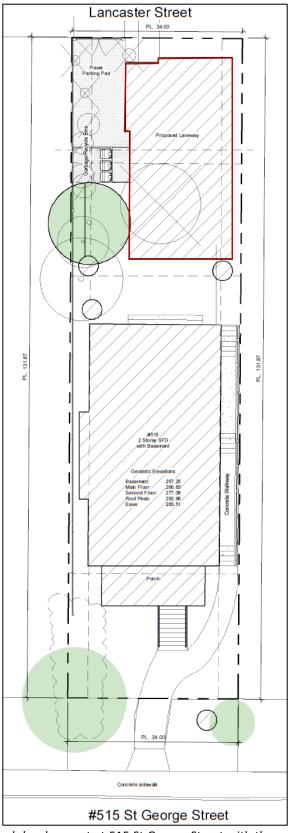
Site Plan of the proposed development at 515 St George Street with the preservation of Adams House insitu and the construction of a Laneway House at the back of the property, outlined in red at the top of the plan. (Source: D3 Design)
